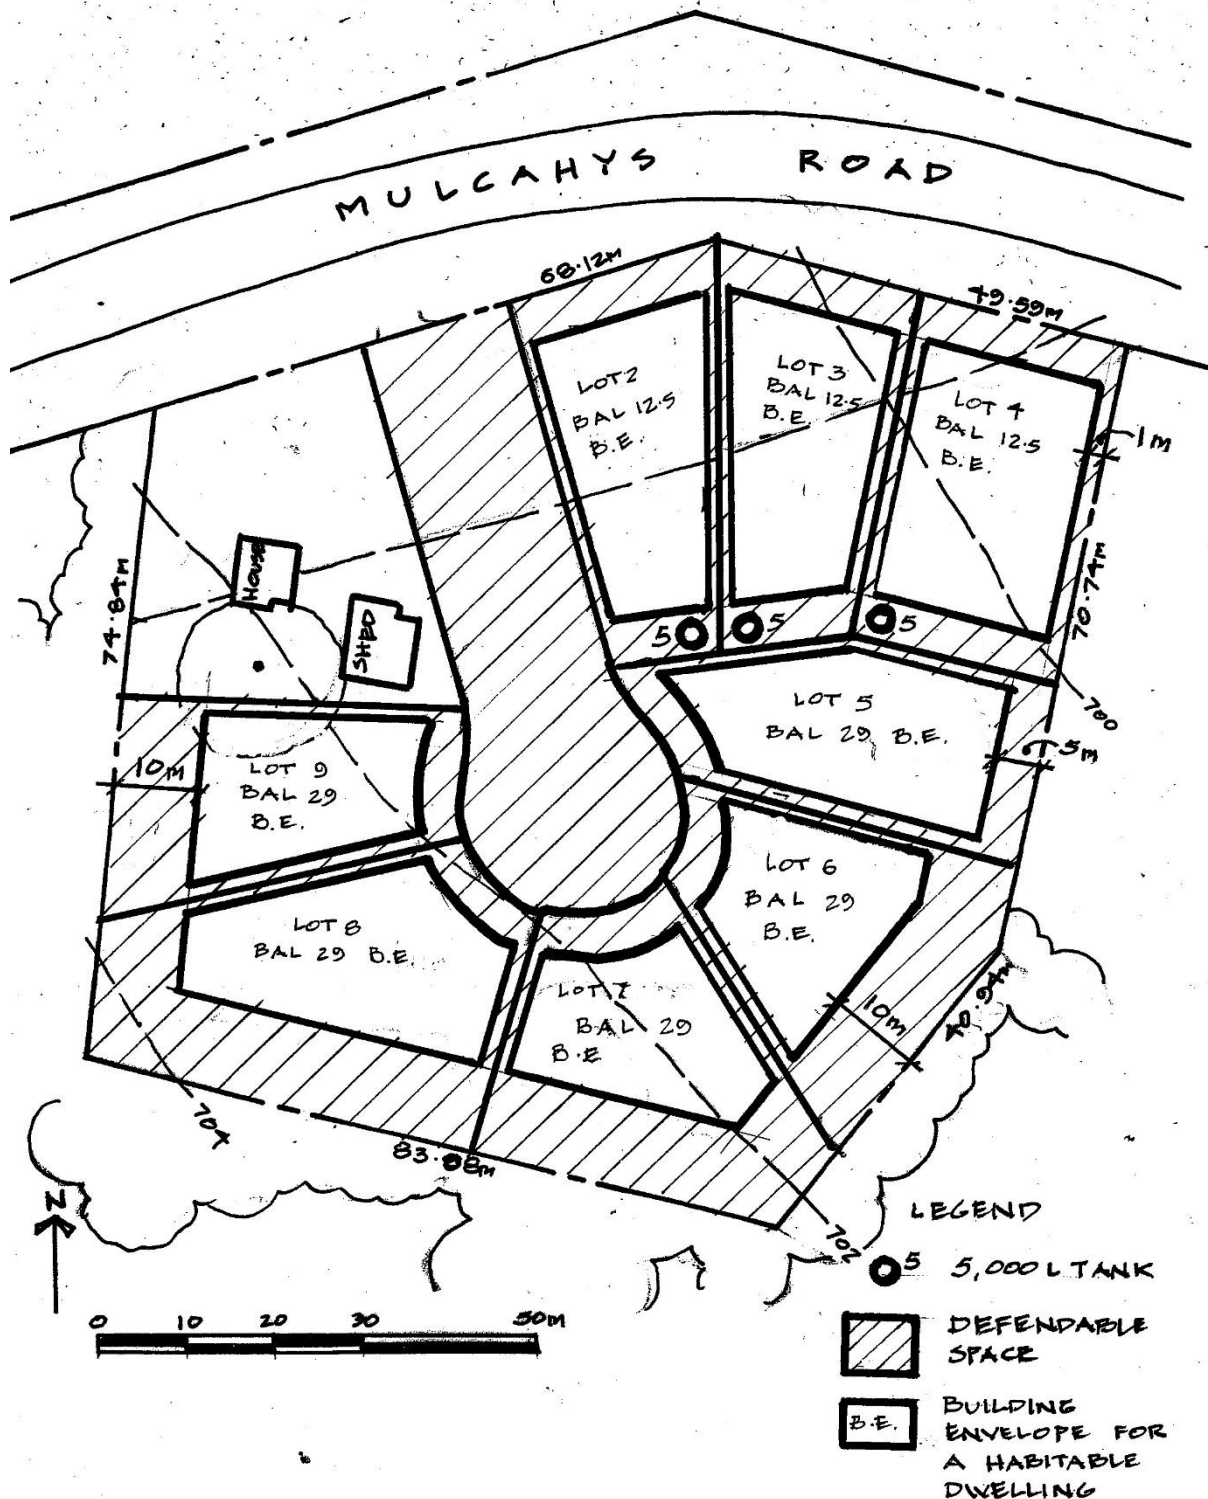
DEFENDABLE SPACE, ACCESS AND WATER SUPPLY PLAN
